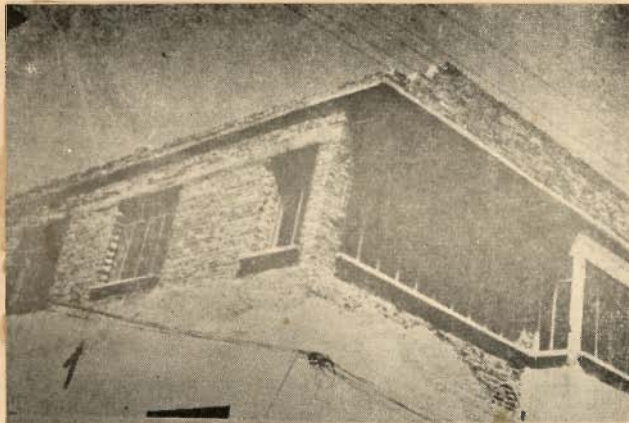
\_ EARTHQUAKE DAMAGE TO UNREINFORCED BRICK PARAPET
